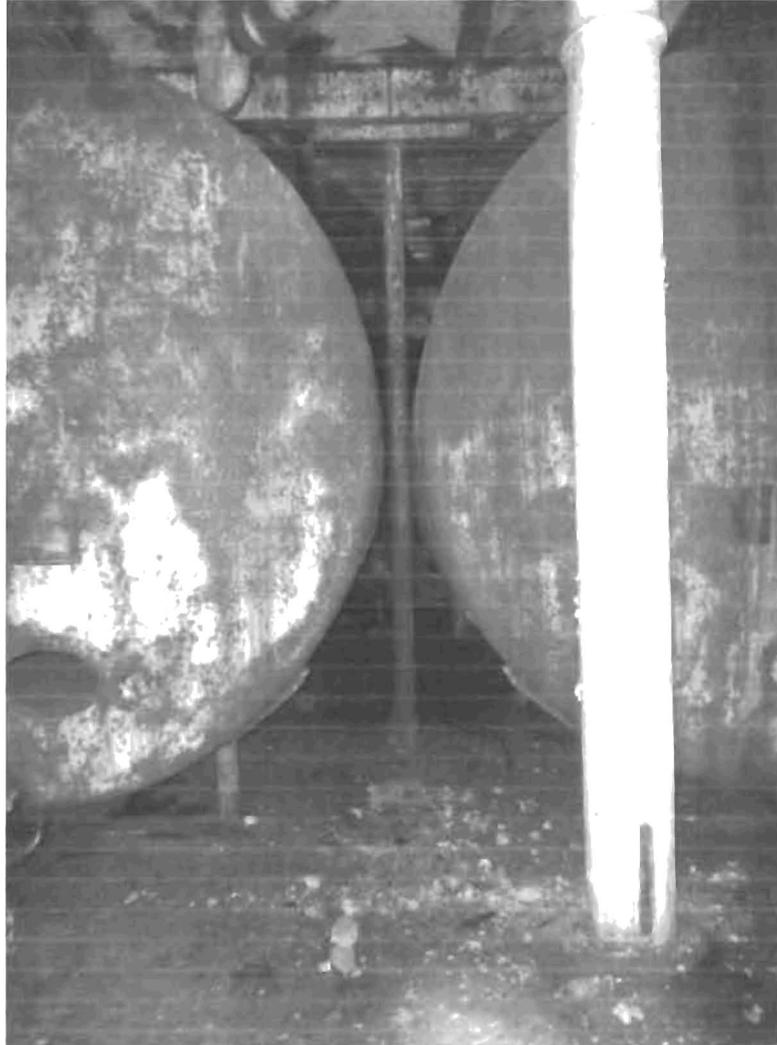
Photo D: Due the lack of proper maintenance over the past several years, the damp environment has caused significant corrosion and deterioration in the basement's concrete and steel structures. This photograph was taken in the basement floor of Building "E".
